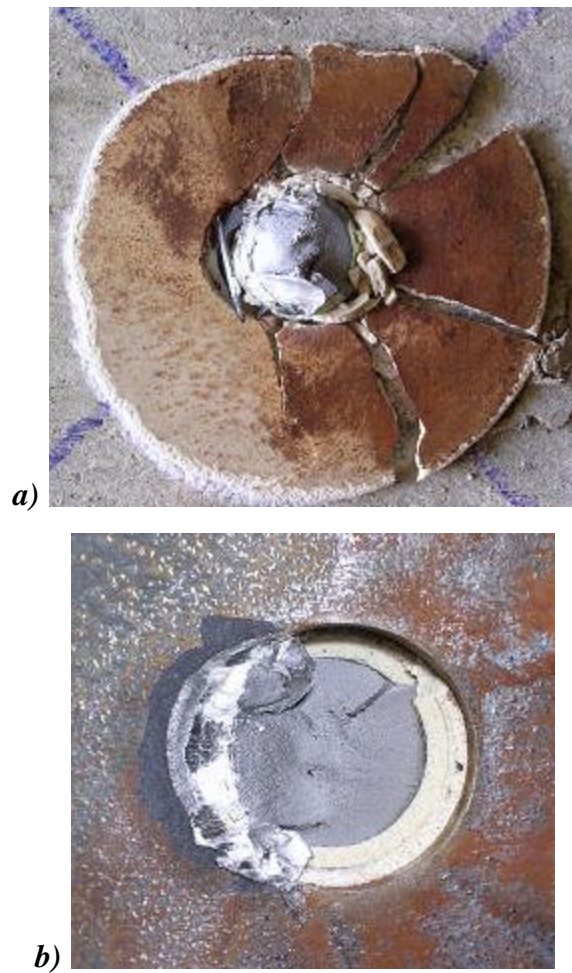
Failed Specimen HASAA30: a) concrete block, b) steel plate
